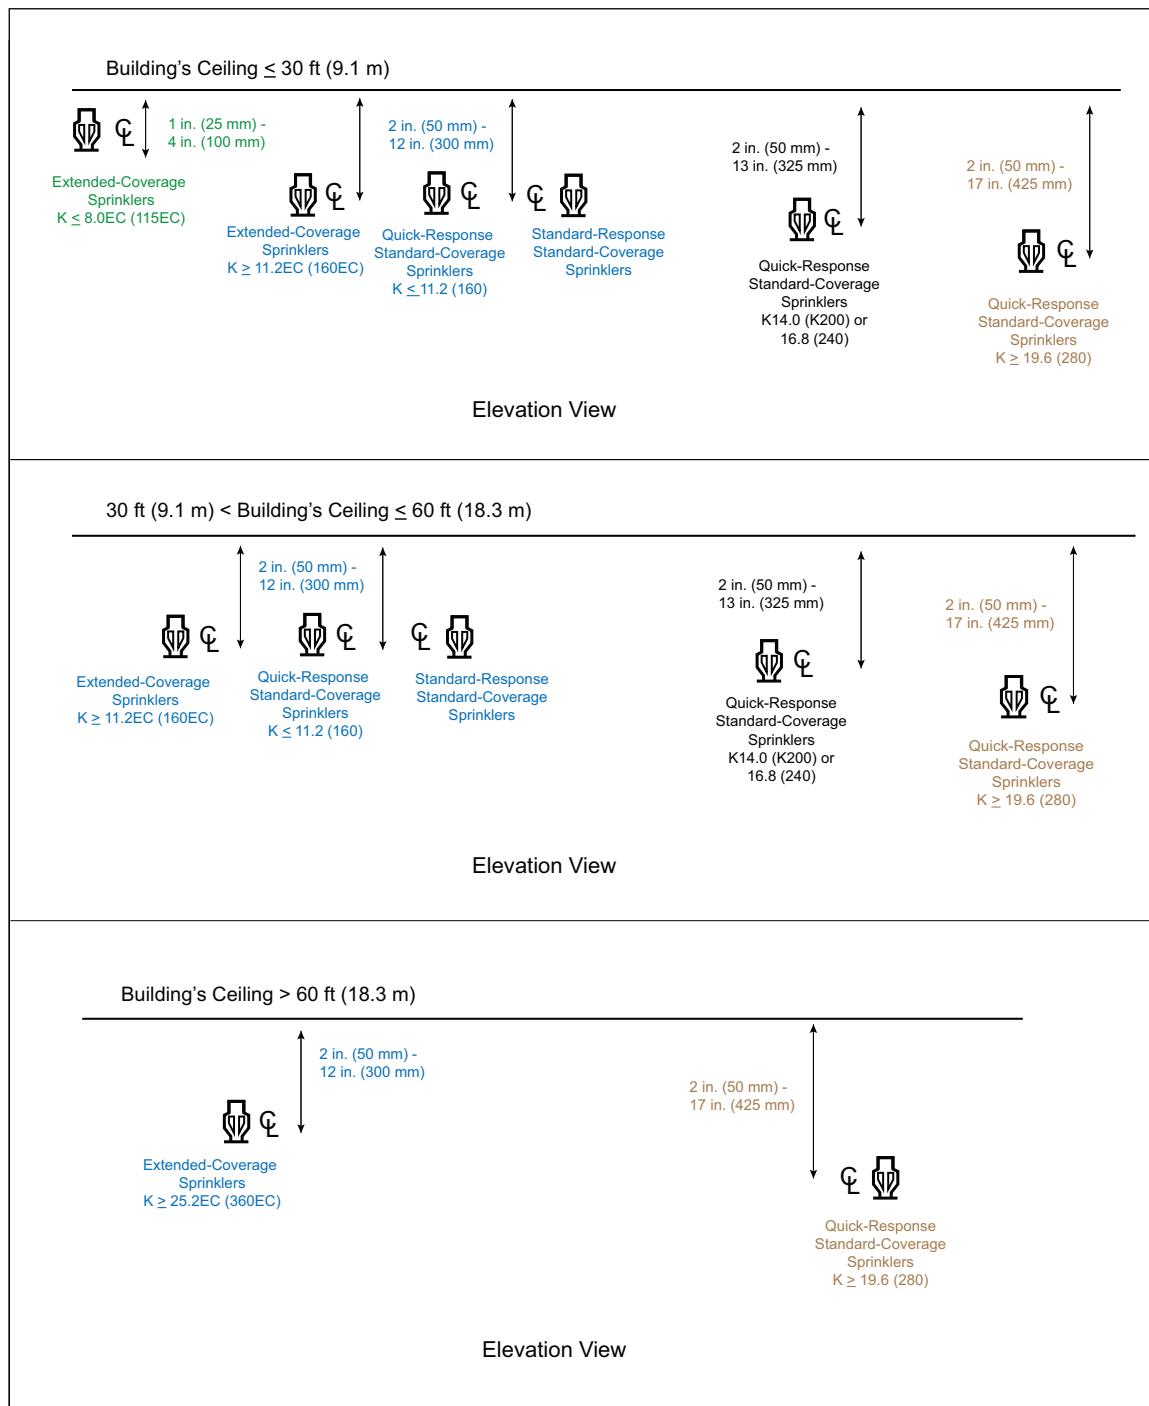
Vertical location of Nonstorage pendent and upright sprinklers under unobstructed ceiling construction for various ceiling heights
